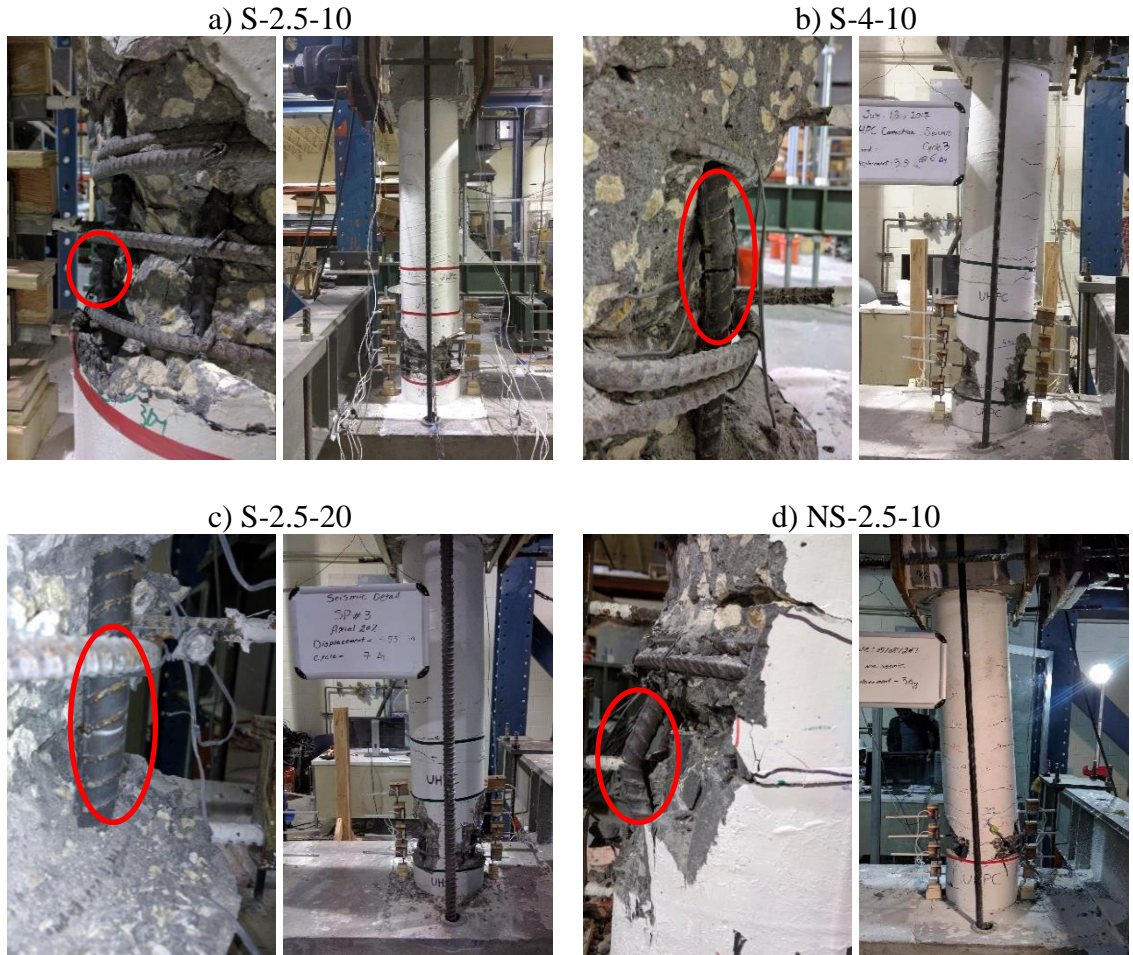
Failure pattern, longitudinal rebar fracture and location of the plastic hinge in the specimens.
